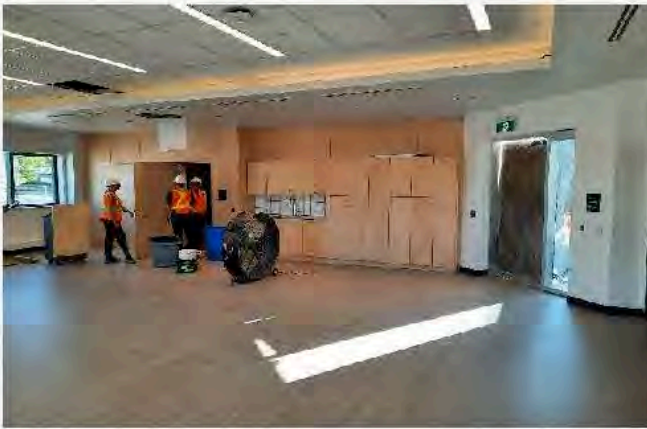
2<sup>nd</sup> floor program room to the west. Vibrations from HVAC units above and leaks in ceiling were detected
